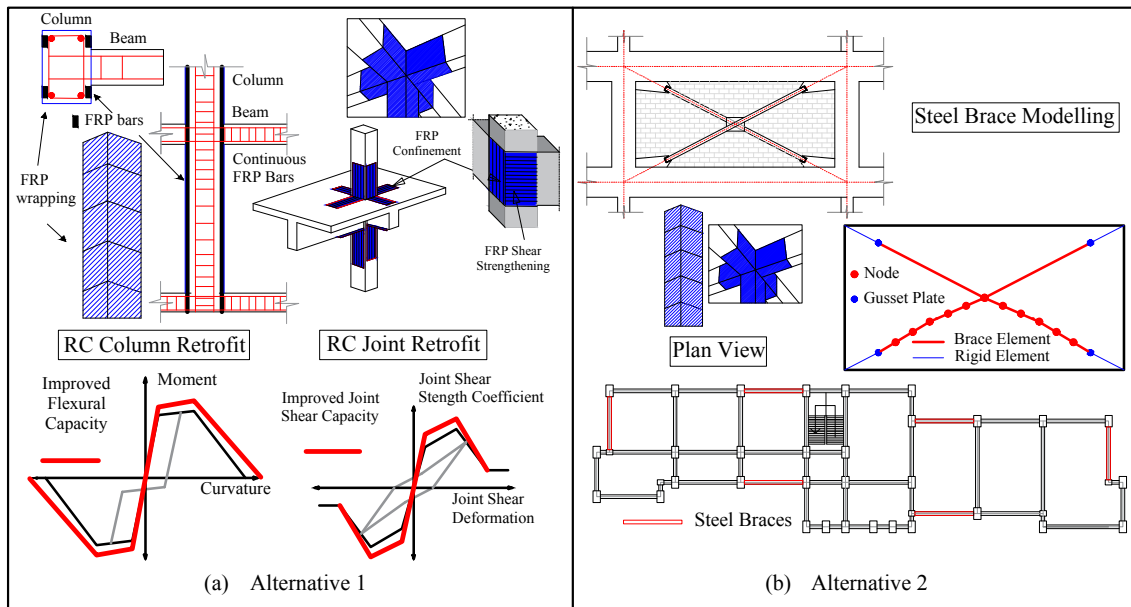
Illustration of retrofit alternatives for the RC case study school building where (a) Alternative 1 consists of FRP bars, wrapping of columns and FRP strips in joints and (b) Alternative 2 integrates Alternative 1 with steel braces, placed in second and third storeys.
